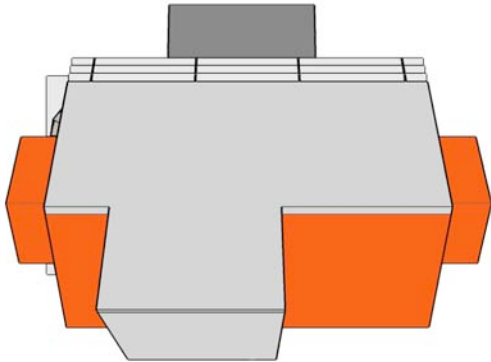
Aluminum roofing/ siding panel installation in the zero energy garage apartment- North elevation.
